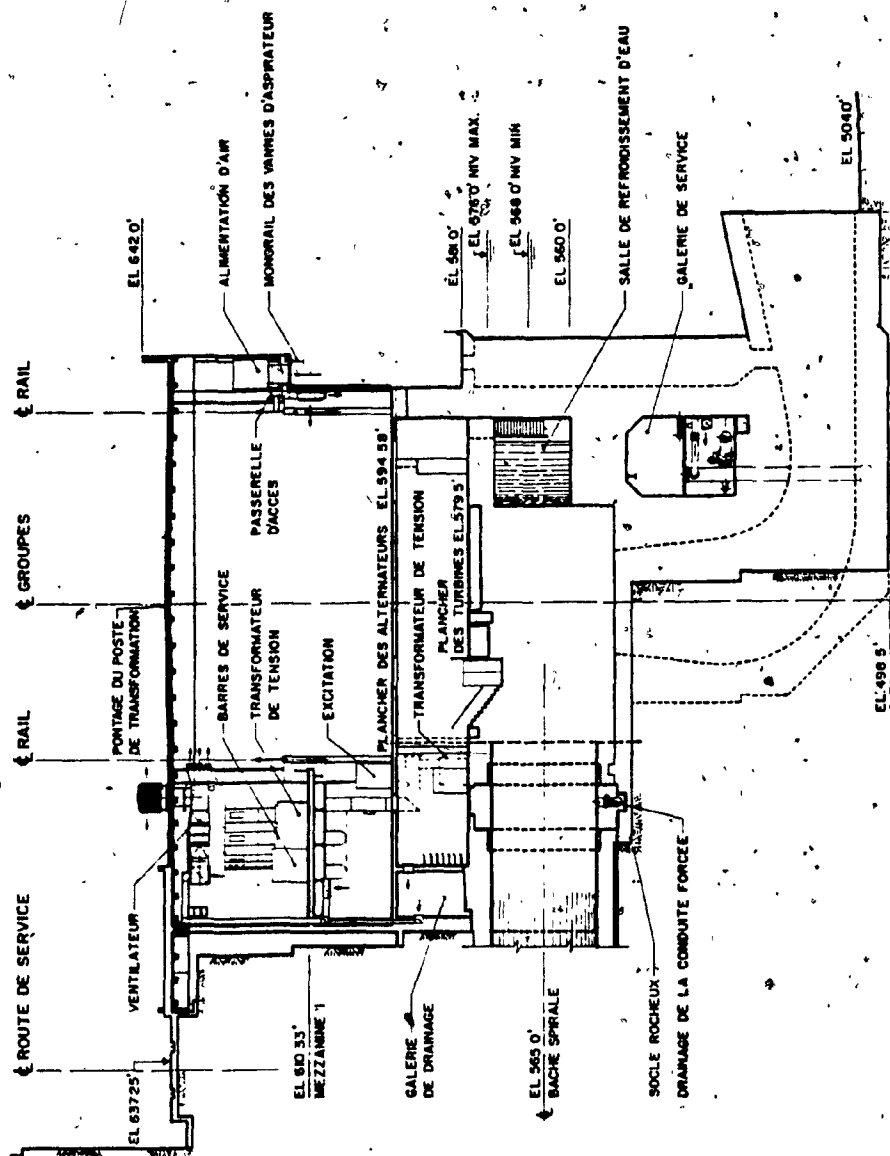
LG-3 Powerhouse, Cross-Section.
